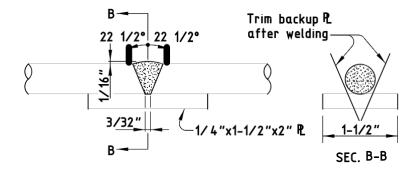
Single Bevel V-Groove Weld in Horizontal Position
